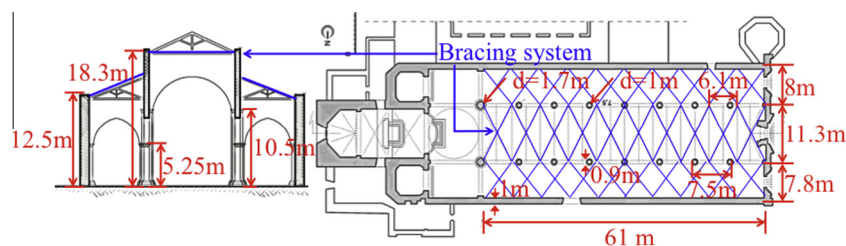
Section and plan view of the basilica of Santa Maria di Collemaggio.
